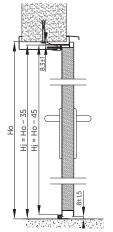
Installation of a single-leaf door with a wrap-around frame to a masonry wall - vertical cross-section
